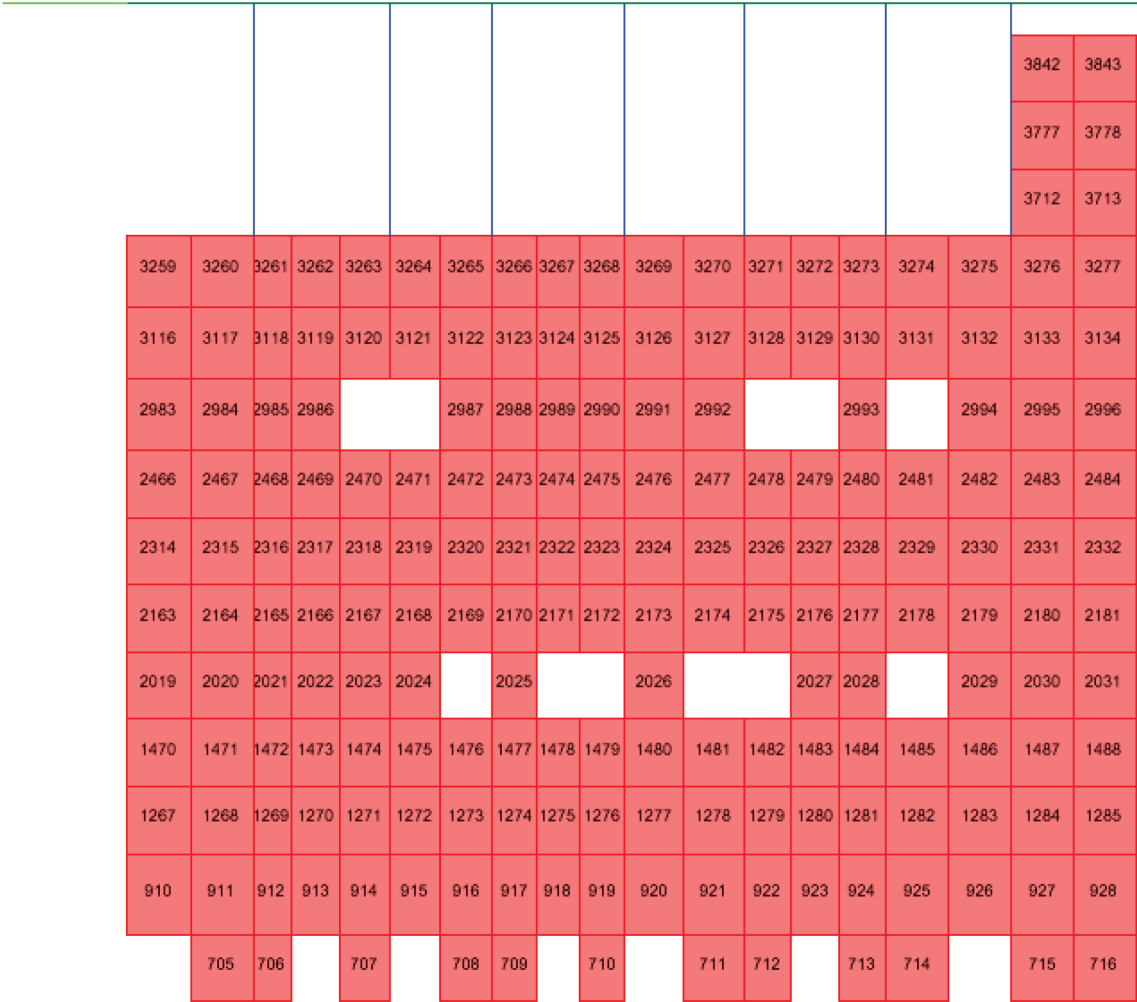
B-66: CRB Reinforcement Elevation at Grid Line 3 Wall
